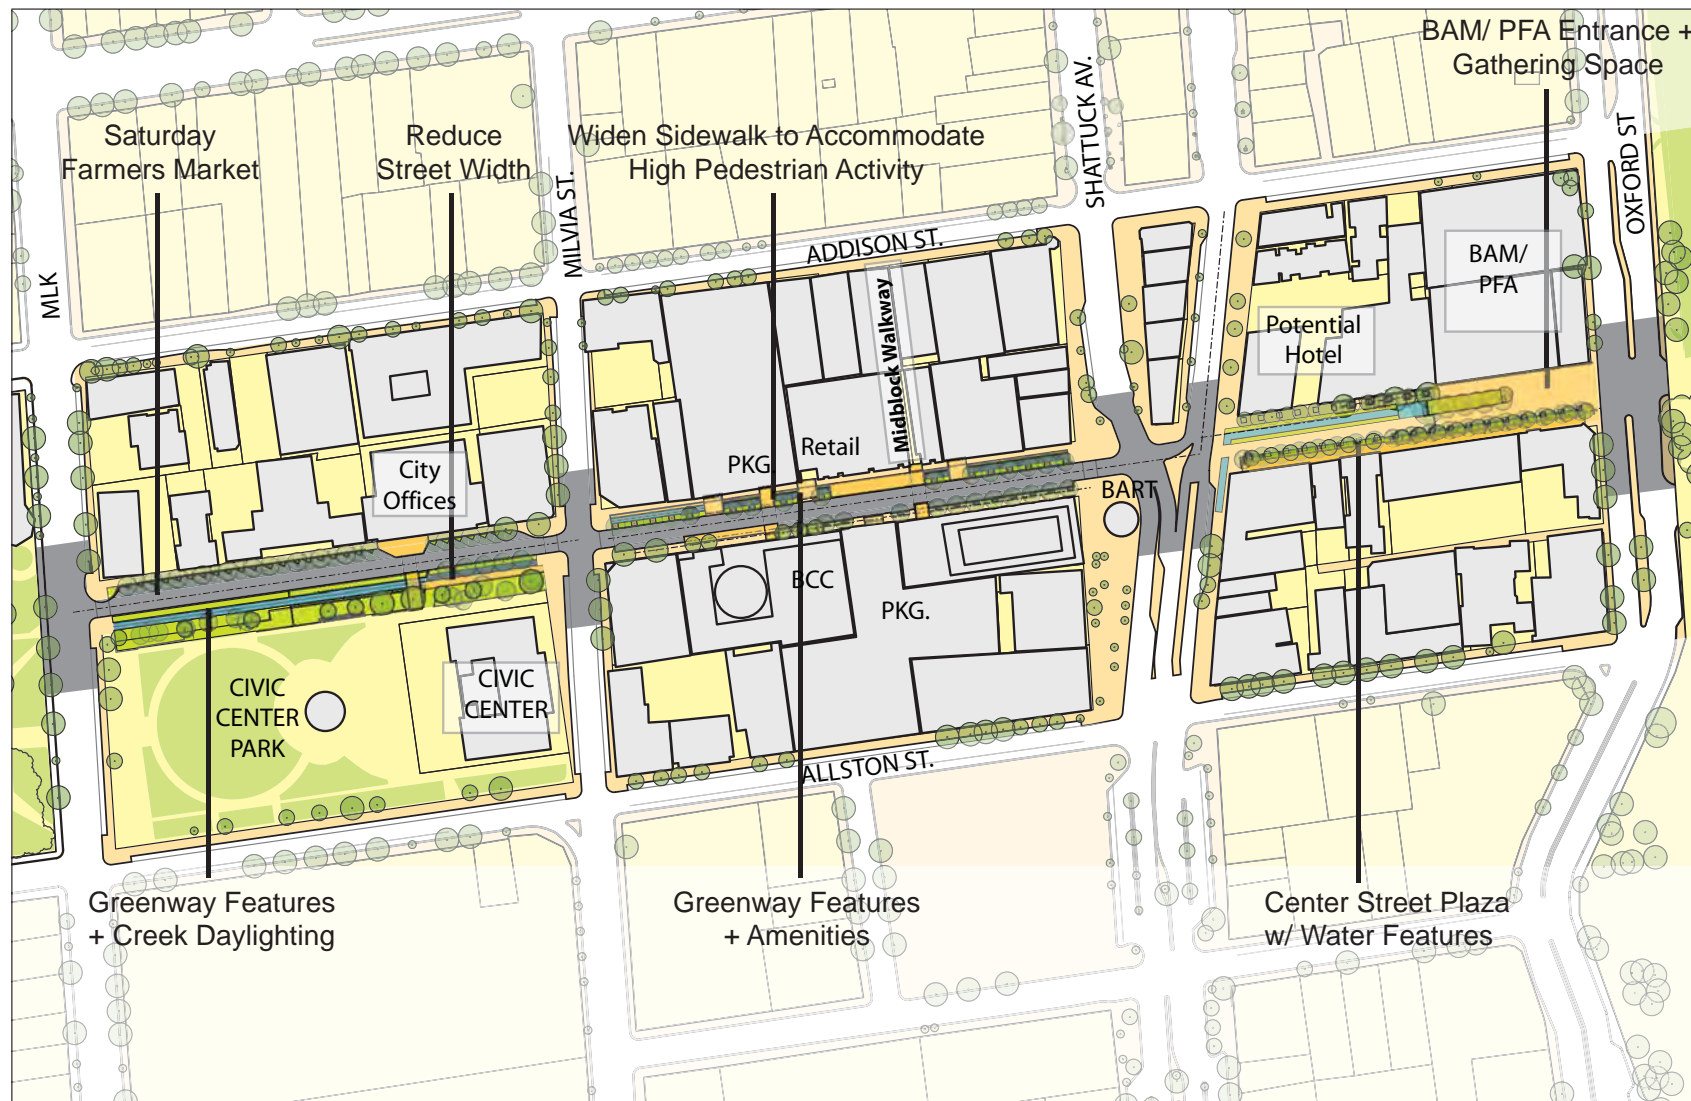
Center Street Plaza (Shattuck to Oxford). Successful street improvements along Center would be retained (photo & existing conditions section above).
